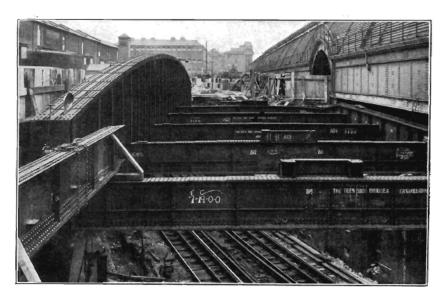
Plate H: Photo of showing bow string girder over the Bishop's Road tunnel at the west end of the London Street Deck
